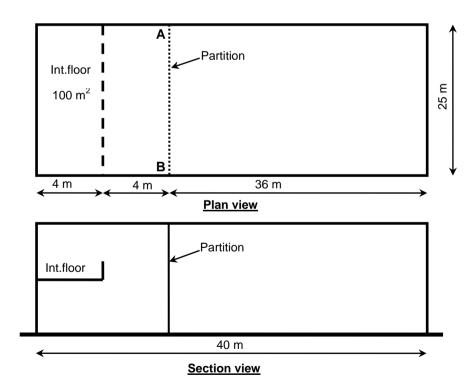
Schematic of a firecell containing open intermediate floor and partitioned lower floor. (Not to scale)
